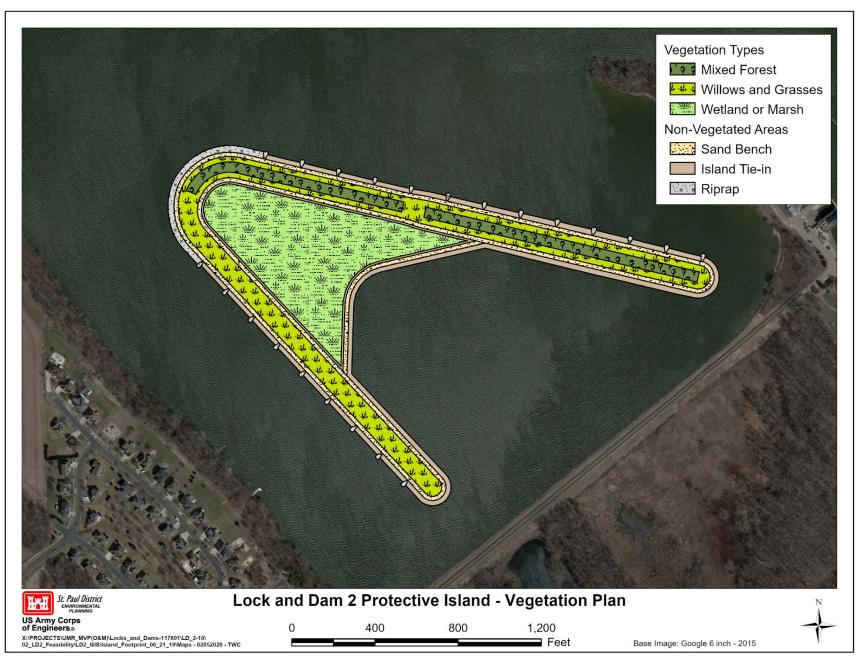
Lock and Dam 2 Protective Island Project proposed vegetation areas and vegetation types.
